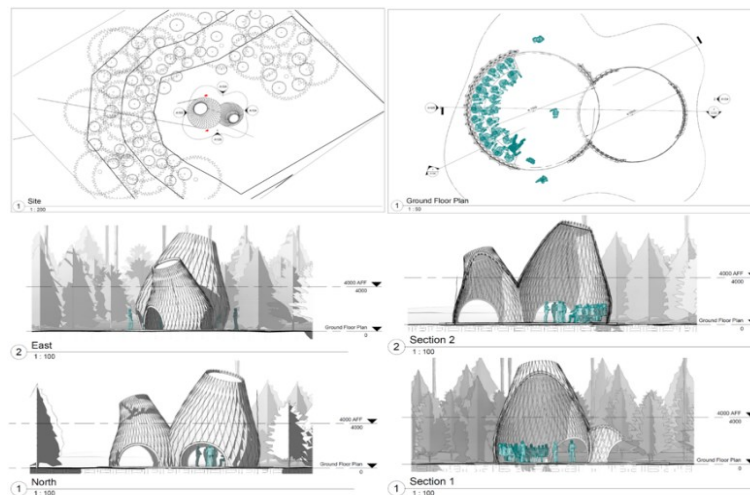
Model construction, site (top left), floor (top right), elevations (bottom left), and sections (bottom right)
